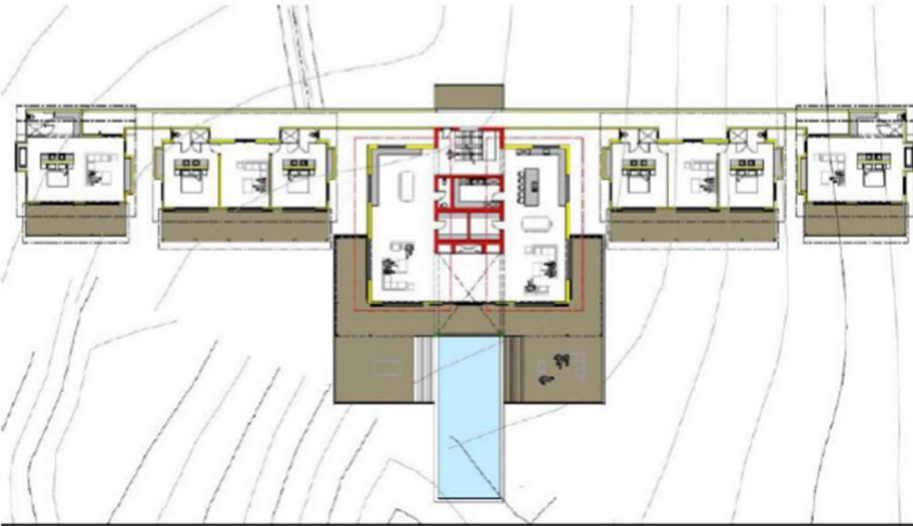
PROPOSED MAIN DWELLING HOUSE
